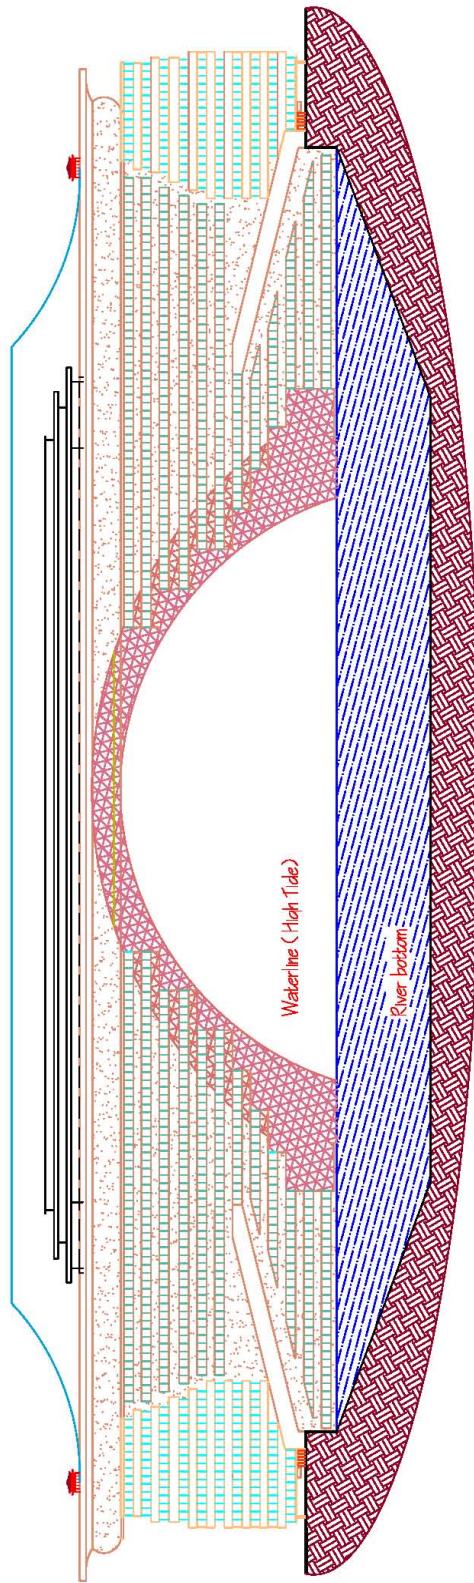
Elevation of the bridge and office ground structure facing Me Ling Square
